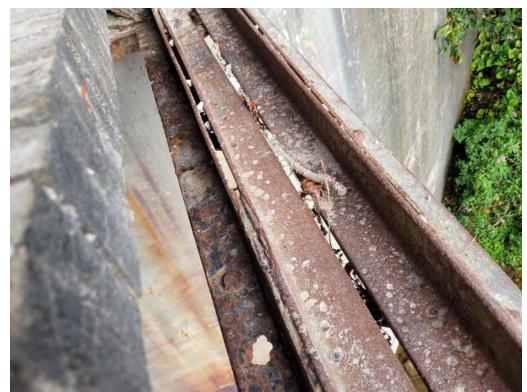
North truss, Joint 4 showing section loss at diagonal eye bar and vertical web plate.
